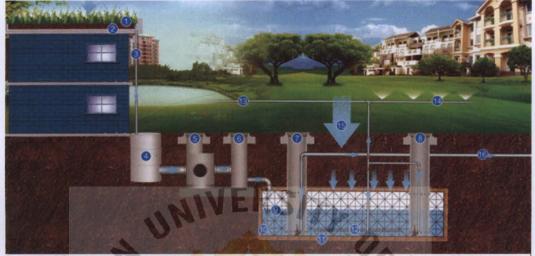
2Rainwater harvesting image, source; Geening solution, Stormwater Storage Module
